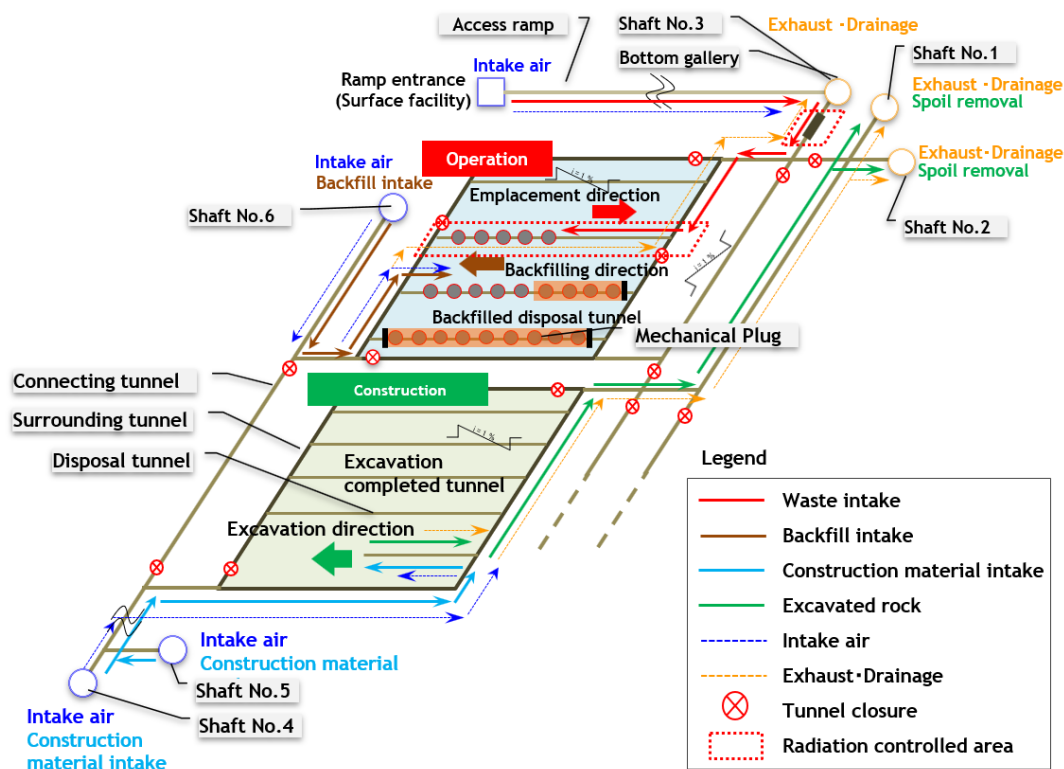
Conceptual sketch of tunnel layout (HLW TT panels)
